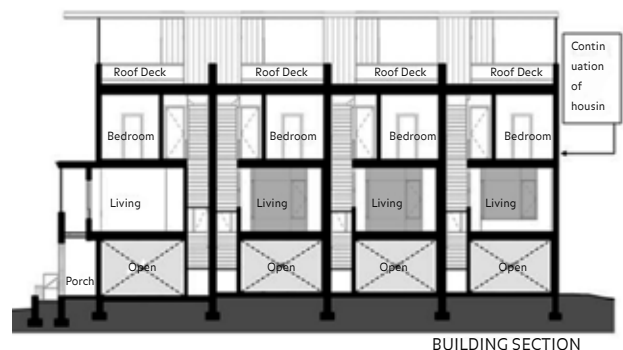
Section showing continuous row housing on stilt, minimum 8 to 10 feet high (Source: Author)
